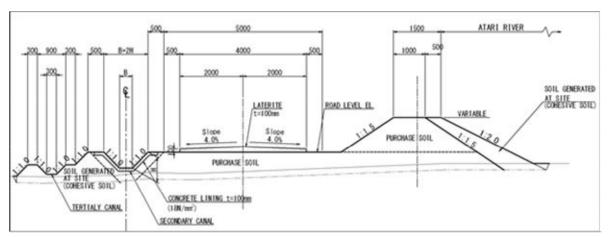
Standard Cross Section of Flood Protection Dyke
